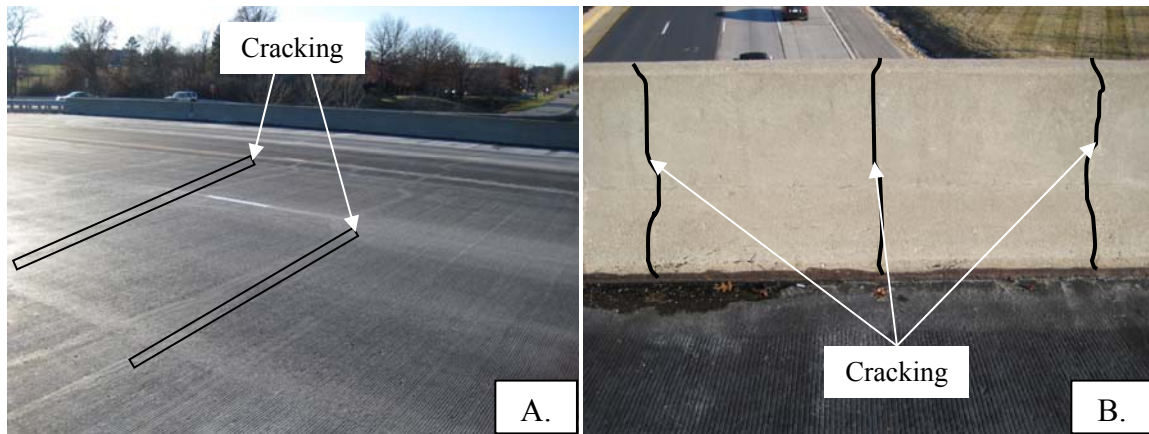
Crack Propagation in Bridge Deck (A. Cracking in the CIP topping, B. Cracking from the CIP topping extending to the concrete barrier (highlighted for clarity)) (Bridge A4704)
